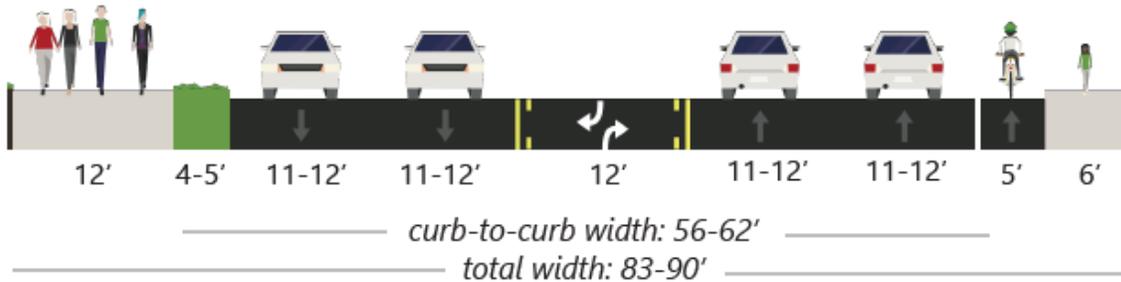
ALTERNATIVE CROSS SECTIONS – WEST: NW STEWART PARKWAY TO I-5 OVERPASS
